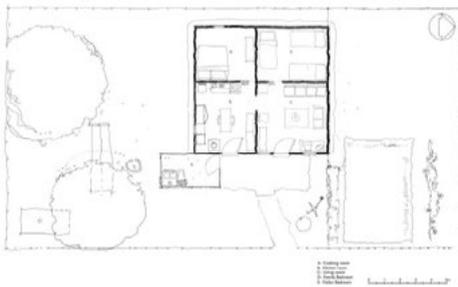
Site plan of one dwelling. A - cooking room, B - kitchen room, C - living room, D - family bedroom, E - visitors' room, F - toilet.
